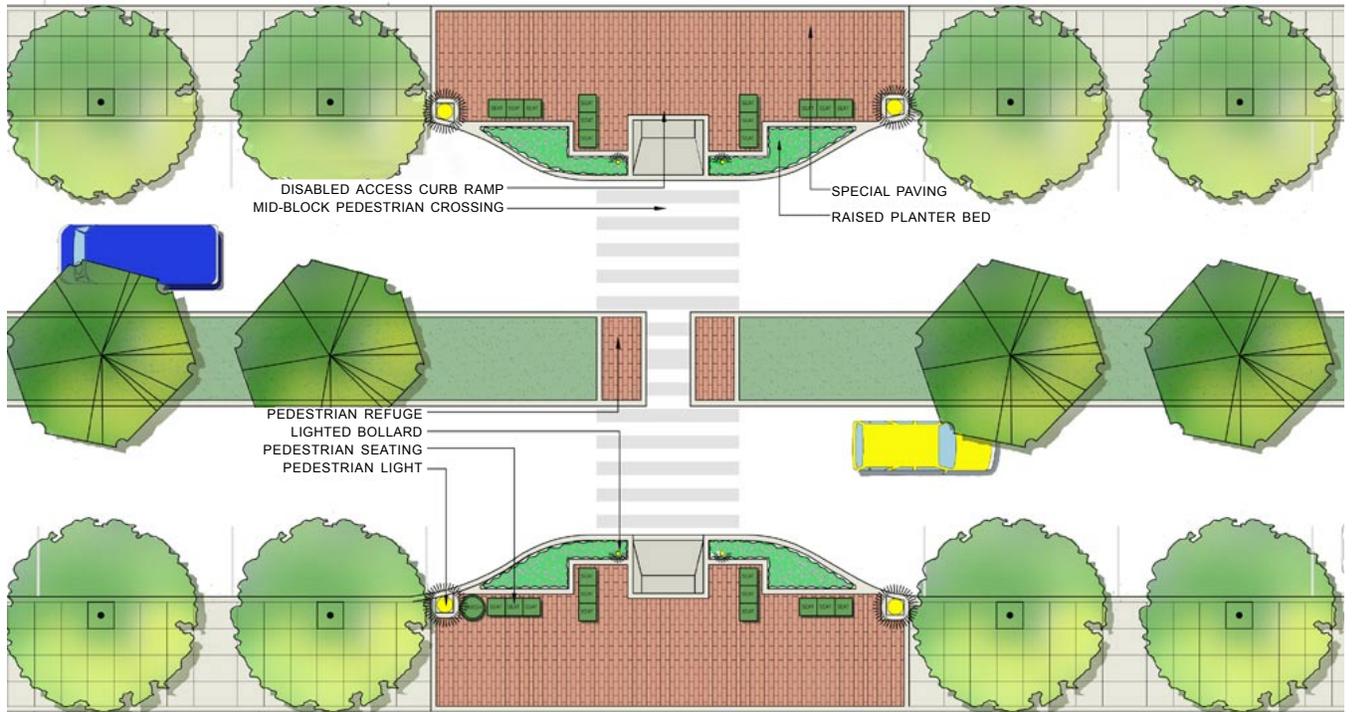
13th Street Prototypical Mid-Block Sidewalk Extension and Street Crossing (shown with optional median)
